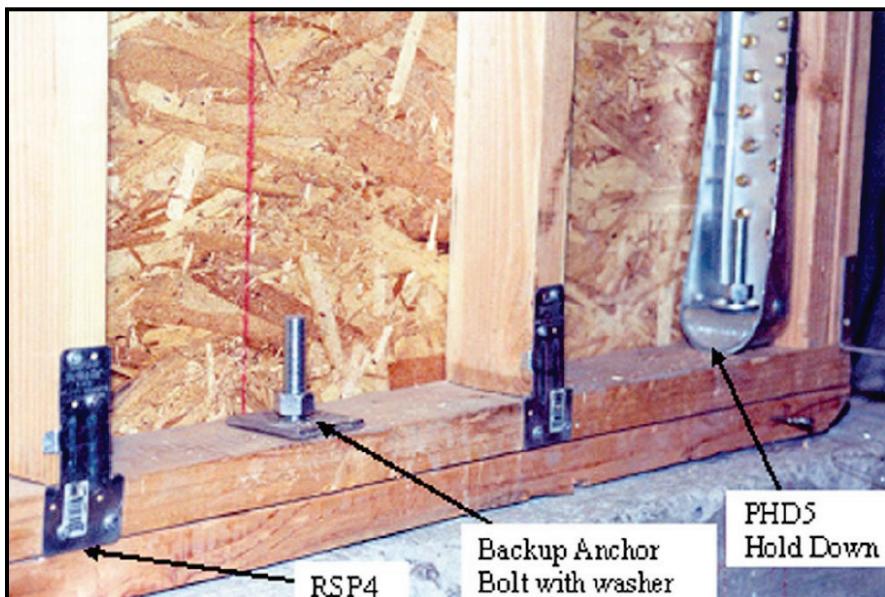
Illustration of several stapled wood shear wall detailing requirements, including hold-down, stud-to-sill plate connector, and backup anchor bolt. Photo from Talbot et al. (2009).
